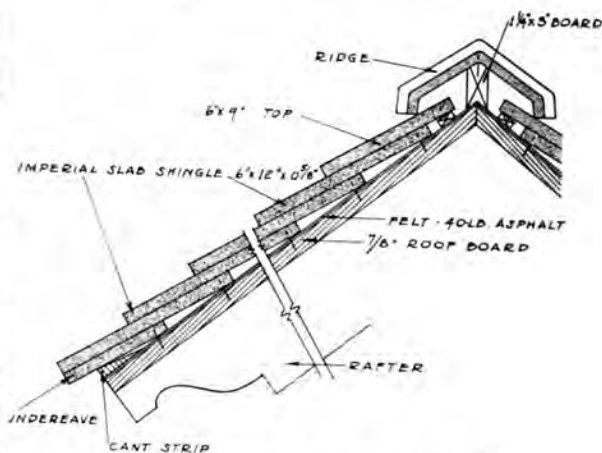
Section Showing 6-inch Slab Shingle Tile
